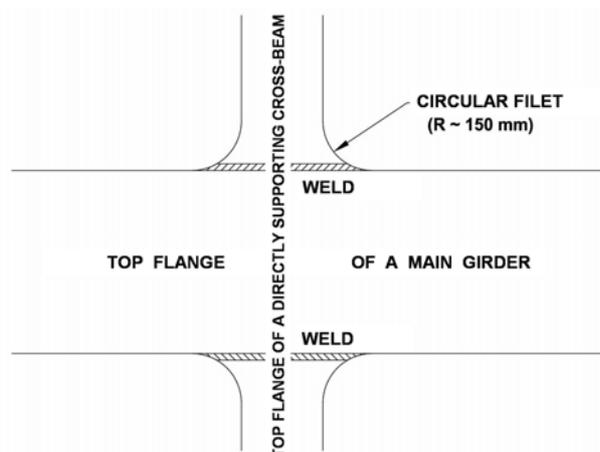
Assembly incorporating circular fillets connecting top flange of a directly supporting cross-beam with cantilevers to a main girder top flange
